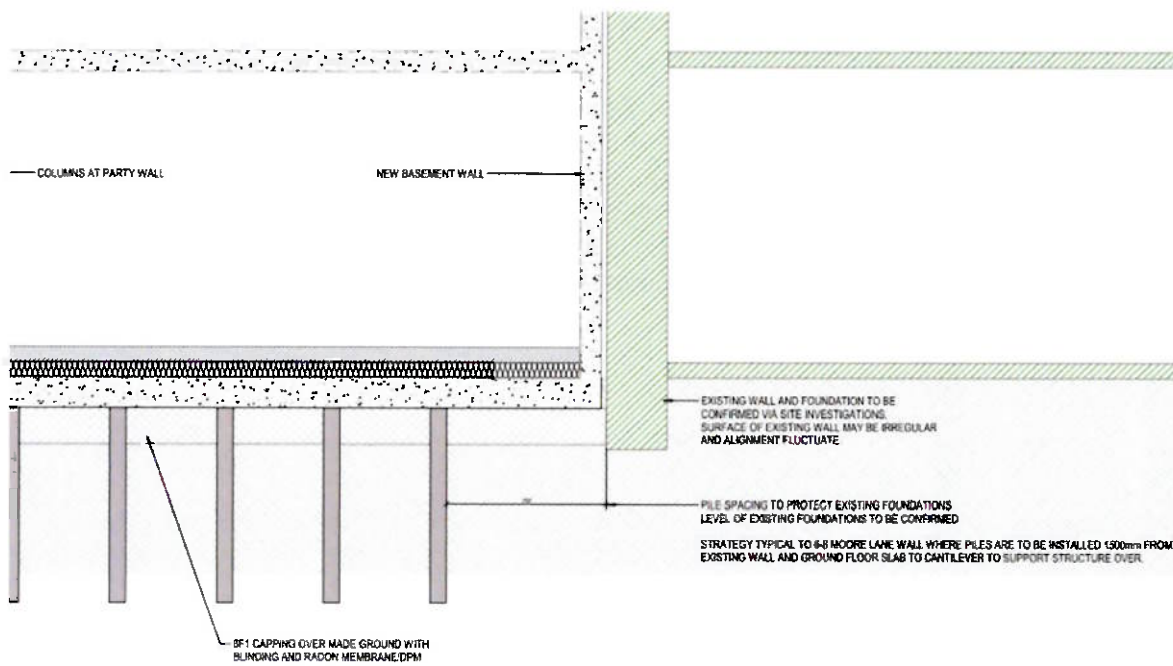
Example of Foundation Adjacent to Retained Structure.
